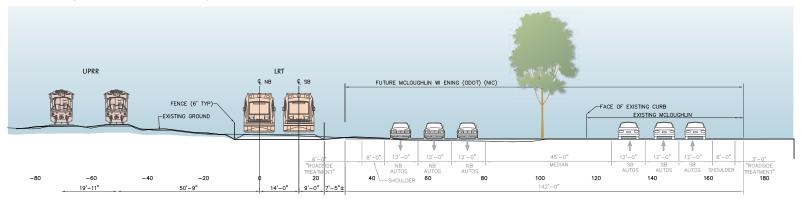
Cross section of light rail alignment and future proposed widening of SE McLoughlin Boulevard
